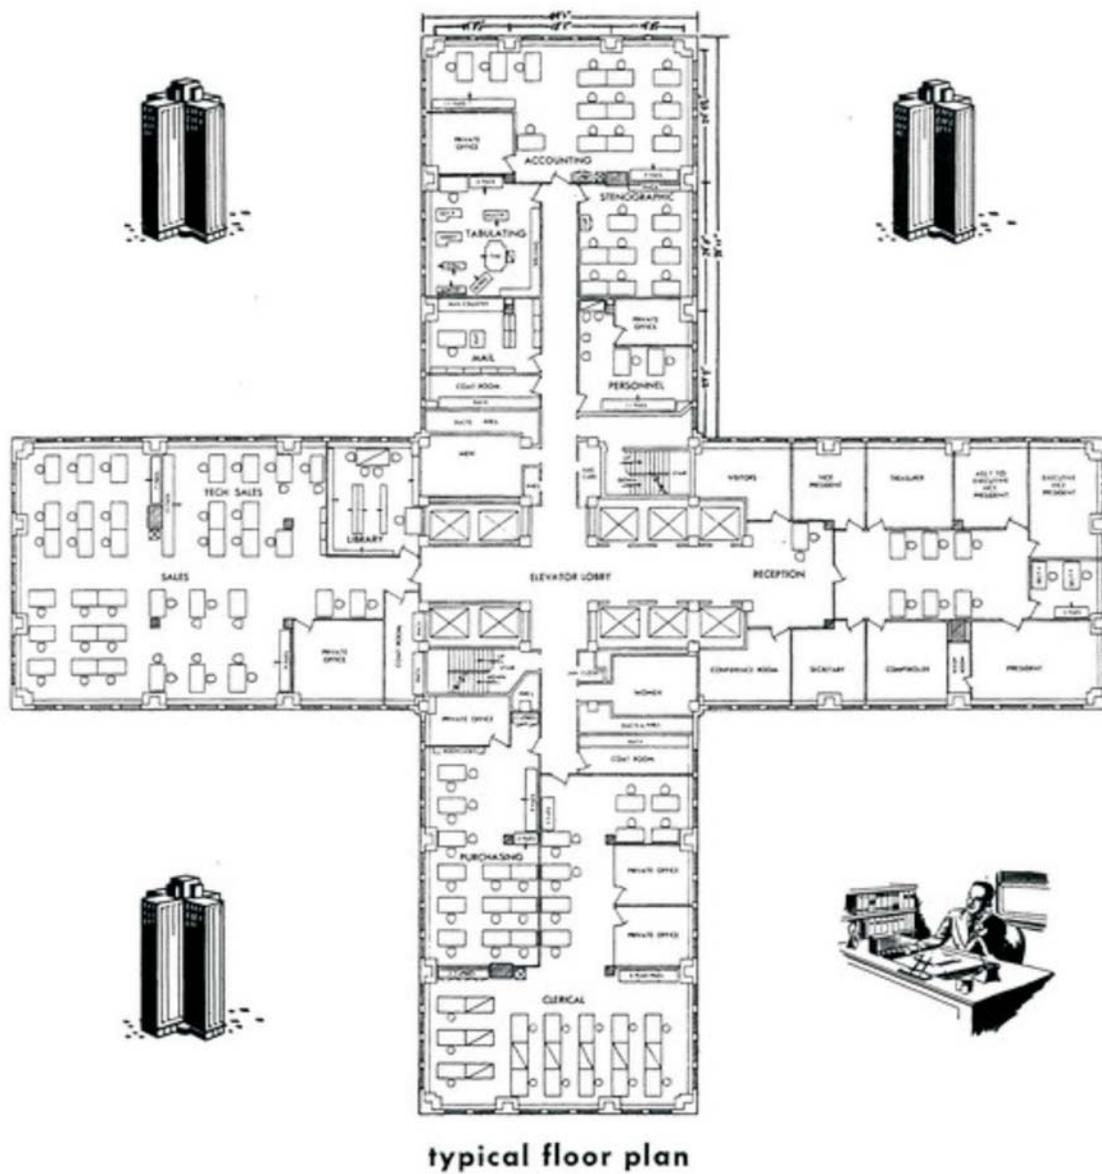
A typical floor plan from One, Two, and Three Gateway Center, showing the central elevator core and double-loaded office corridors (The Charette 1951:11).
